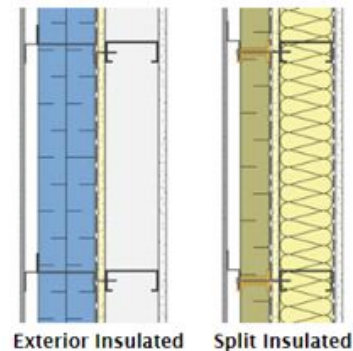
Standard approaches to insulating steel-framed wall assemblies
